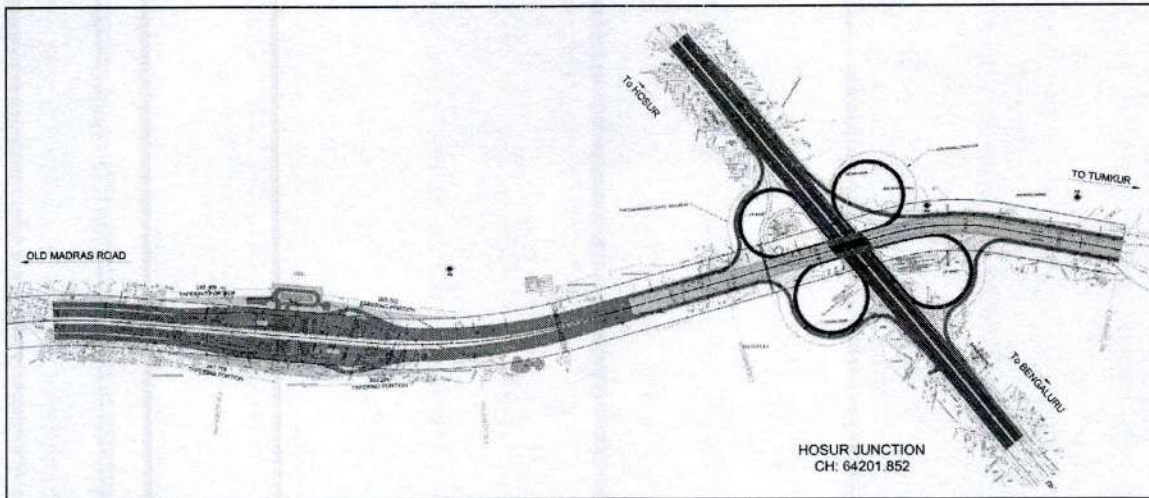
Proposed Cloverleaf Interchange at Hosur Road
